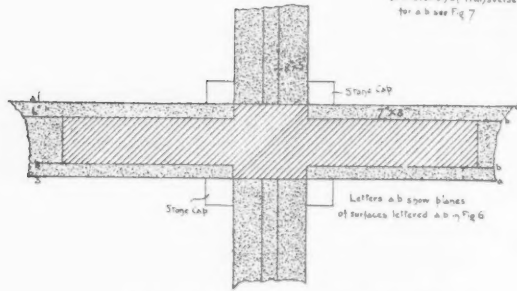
Plan of Blocking Piece over Heads of Columns (EE Fig 6)
